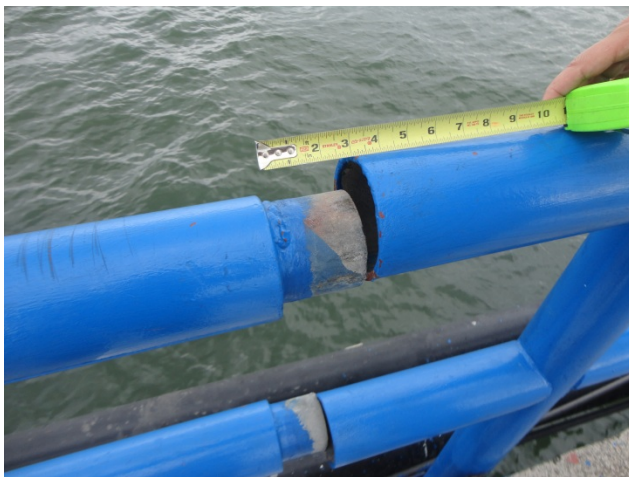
Sections of the steel guardrail that had pulled apart during the earthquake (9.97205° N 84.83078° W).
